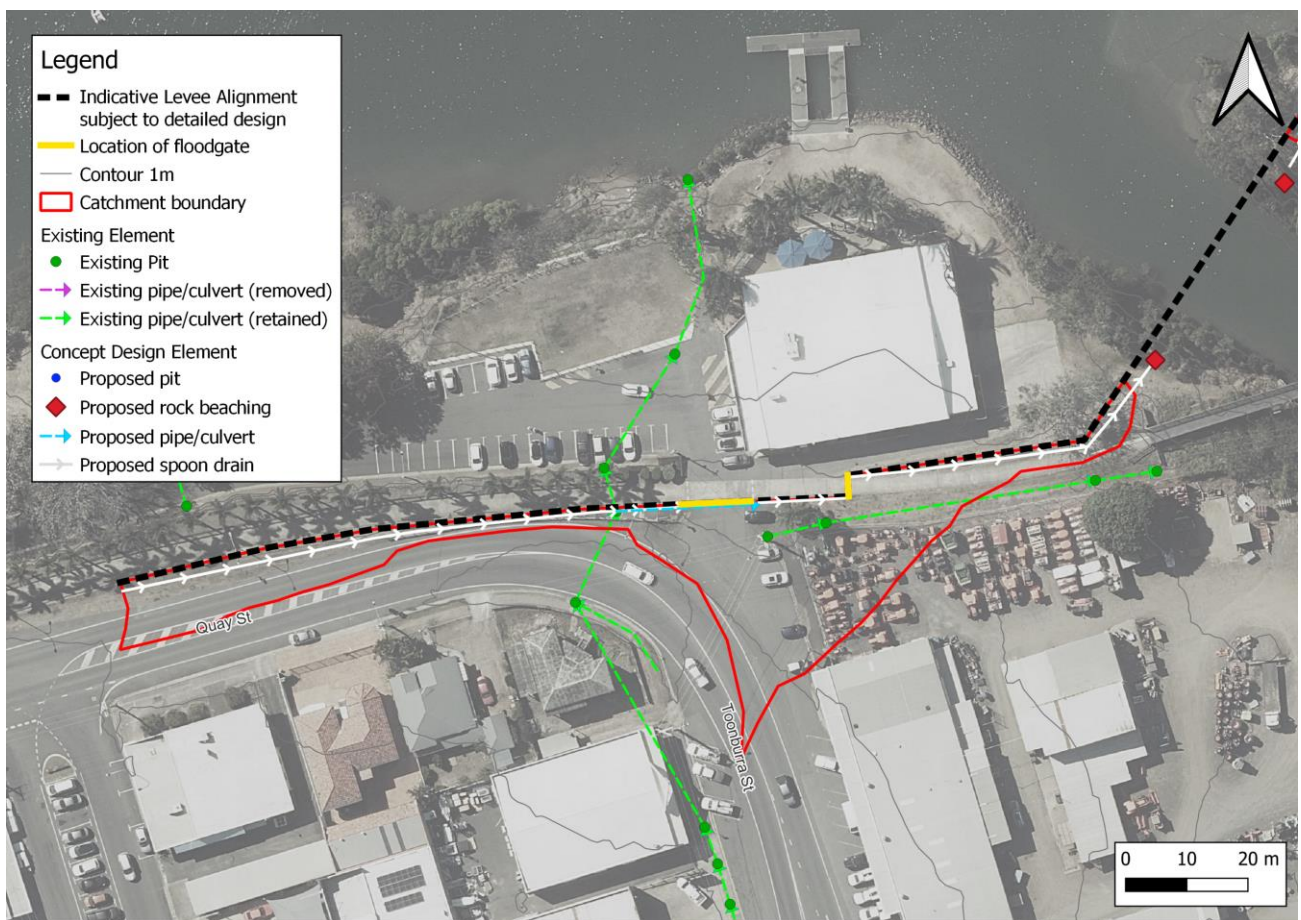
Catchment 1 Concept Drainage Design Layout.
